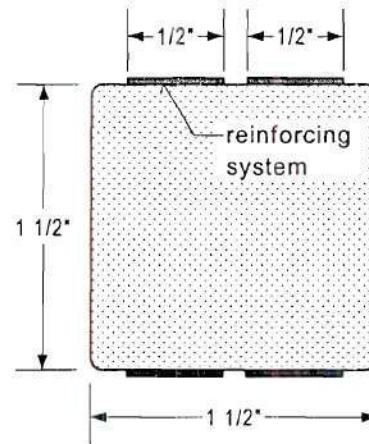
Typical cross section of small-scale specimen with four reinforcing strips
